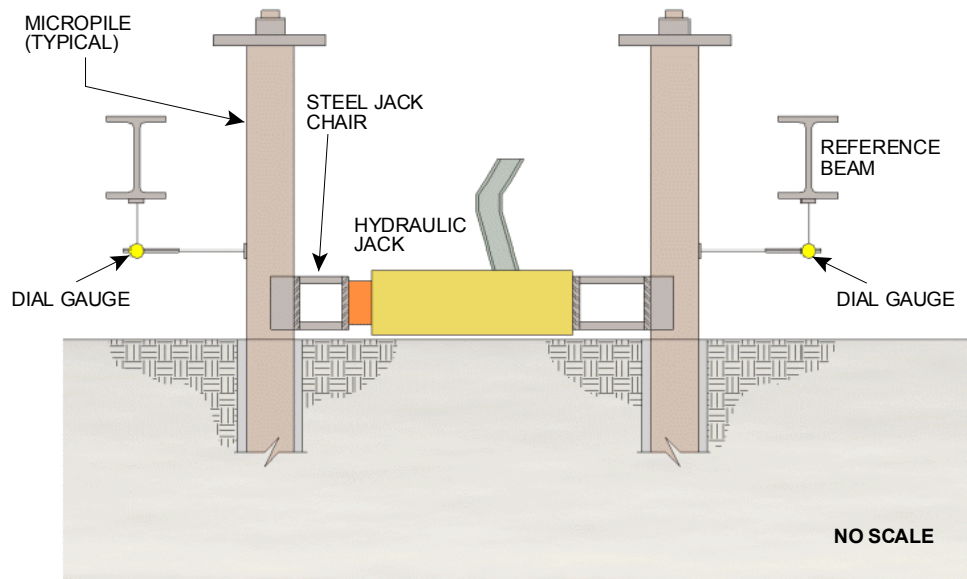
Schematic of Lateral Load Test Arrangement.
